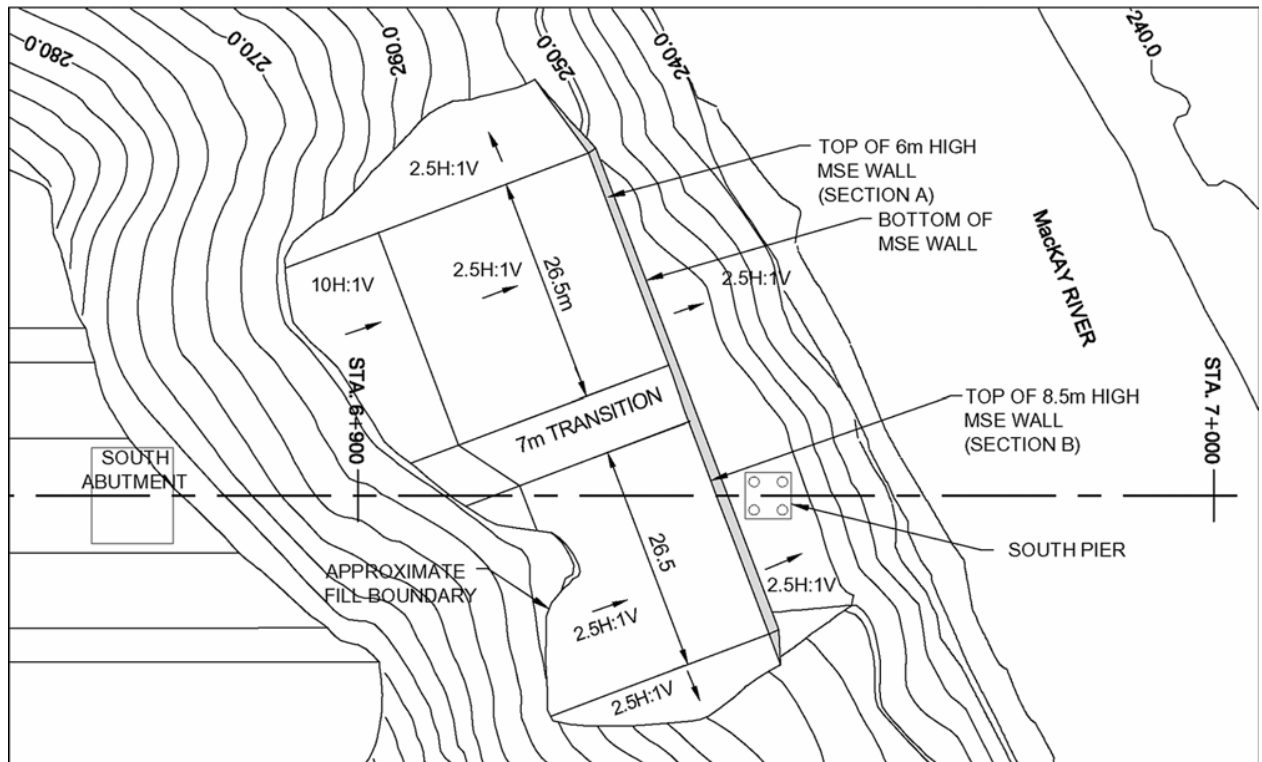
Design Plan – South Slope MSE Wall/Shear Key
